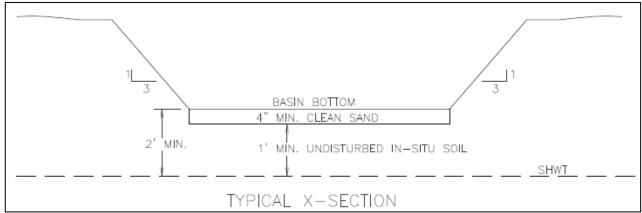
Typical Infiltration Basin: Cross Section (Note: Retaining walls may be used in place of 3:1 vegetated side slopes)
